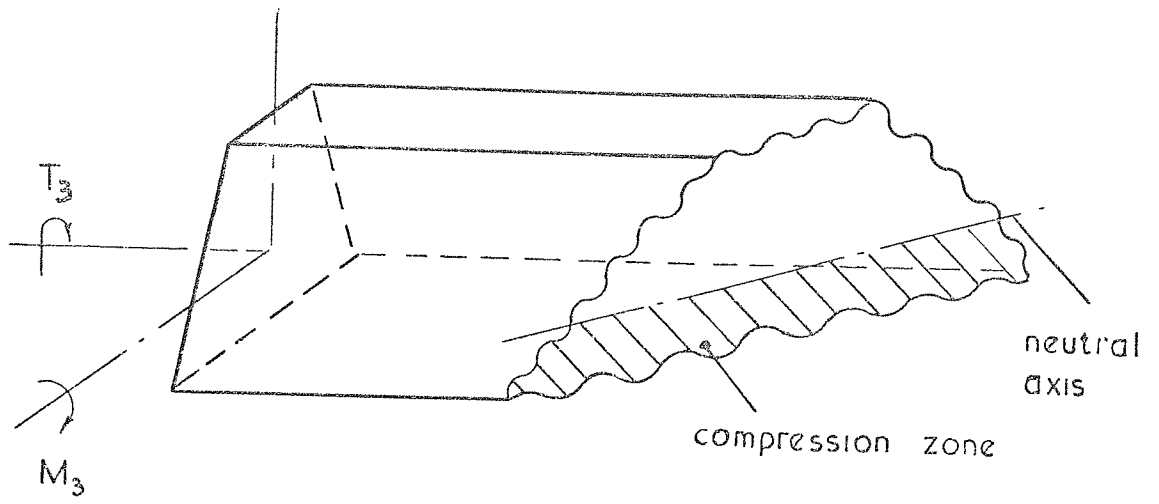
Mode 3 type of failure in plain concrete for a trapezoidal section (no distortion)
